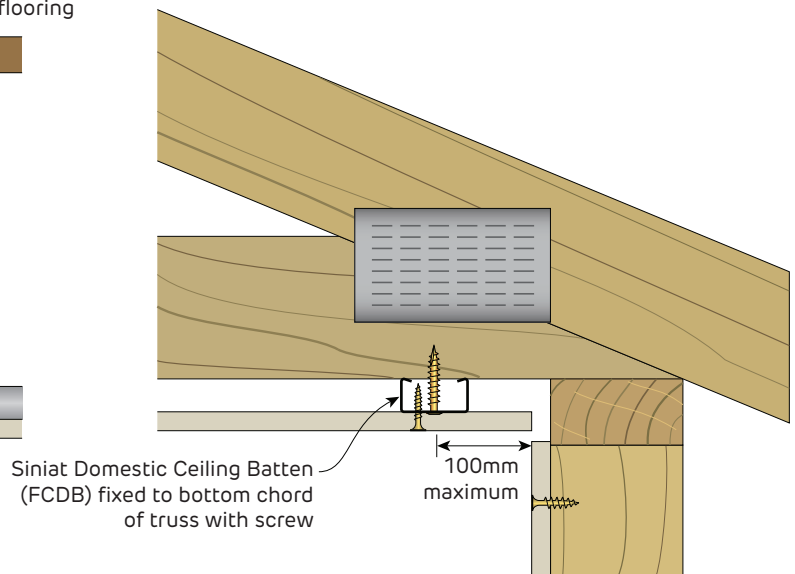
Direct Fix Ceiling to Roof Truss 16mm Domestic Batten fixed directly to trusses Section
